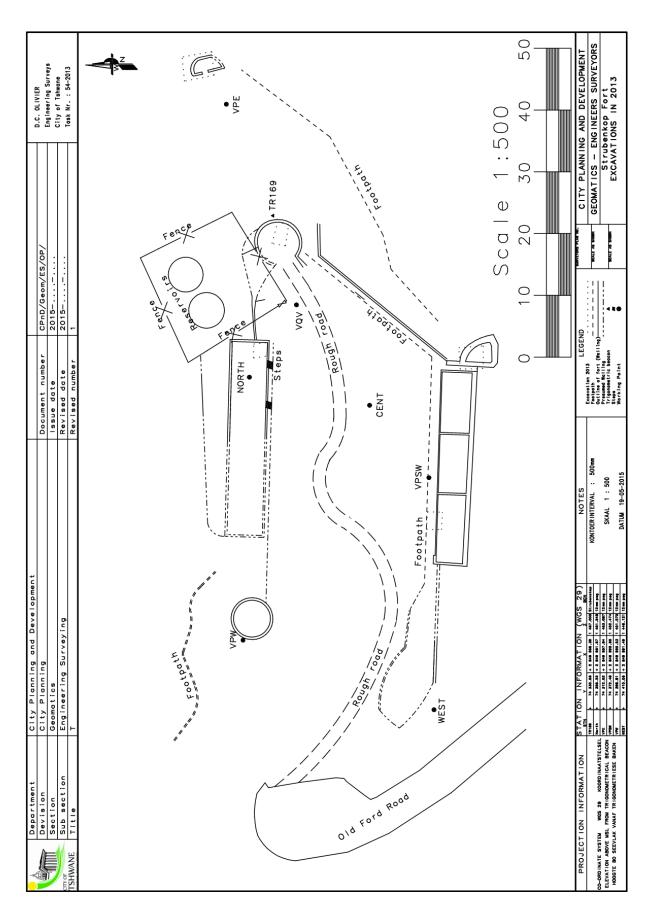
Plan of East Fort indicating excavations (D. Olivier).
